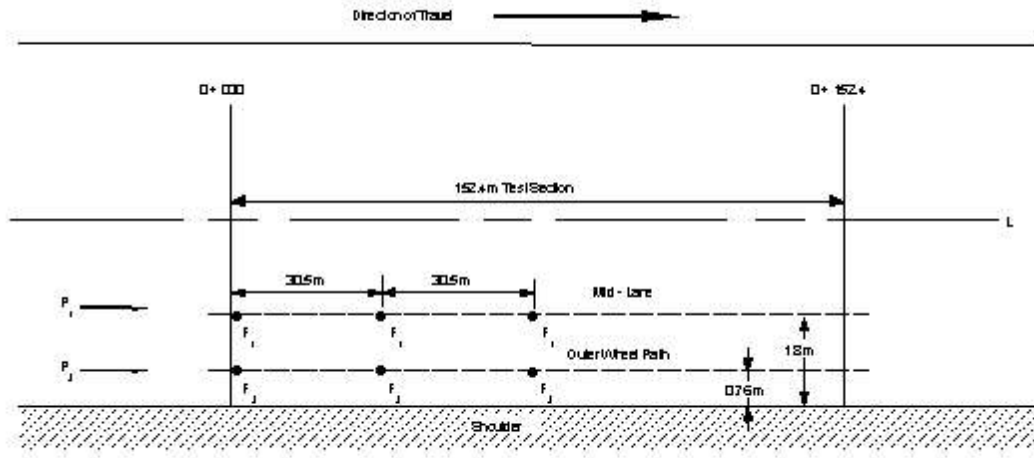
FWD Test Plan for SPS-3 Sections
